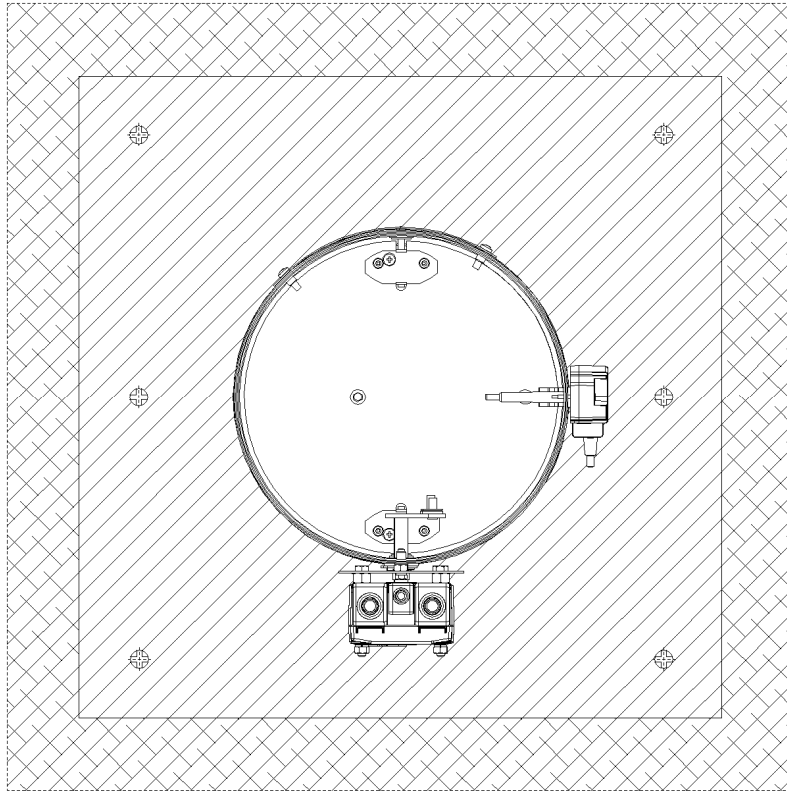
Installation method of fire dampers KTM-O in flexible wall with vertical rotation axis of baffle
